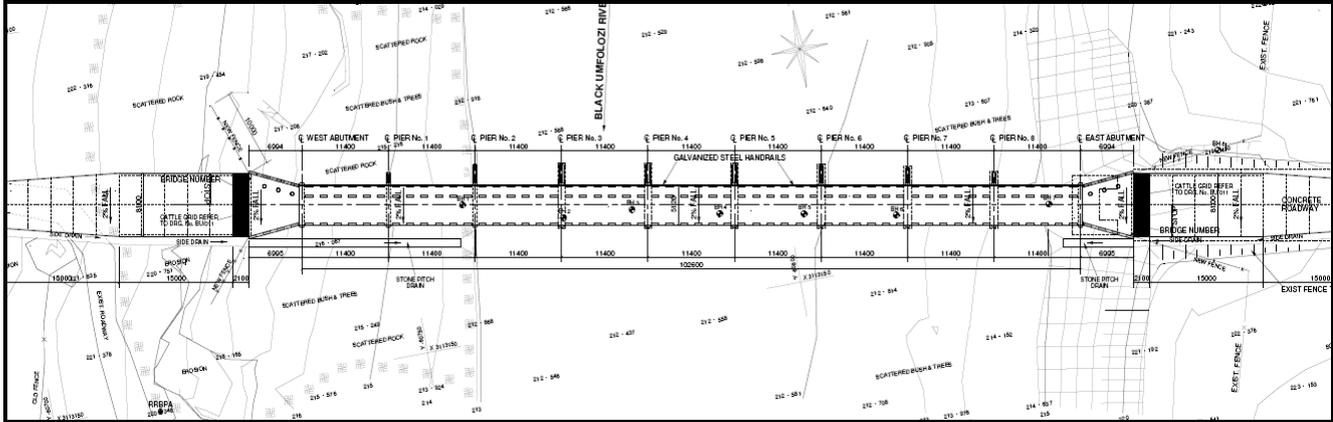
Plan View of the Black Mfolozi River Bridge Site (SANRAL Contract P006-032-2007/1, 2007)
